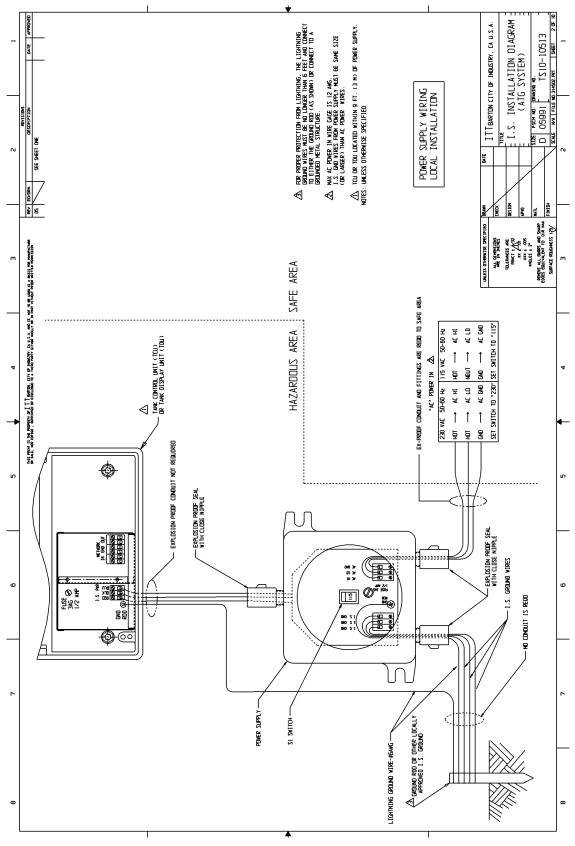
Wiring Drawing TS10-10513 (2/10)
